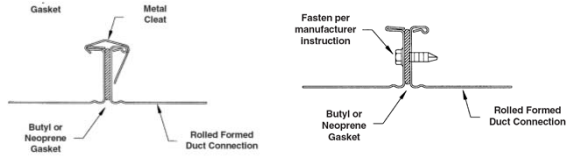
IMPROPER FIRE DAMPER INSTALLATIONS
